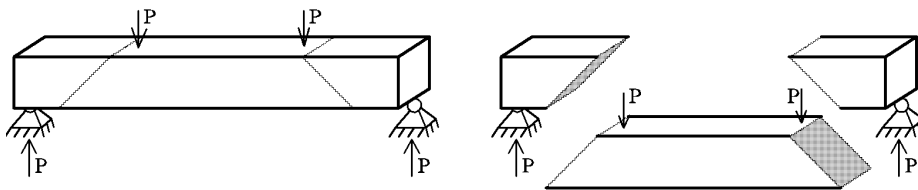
Damage at failure in series of tests on beams without transverse reinforcement. (After Leonhardt, 1962.)
